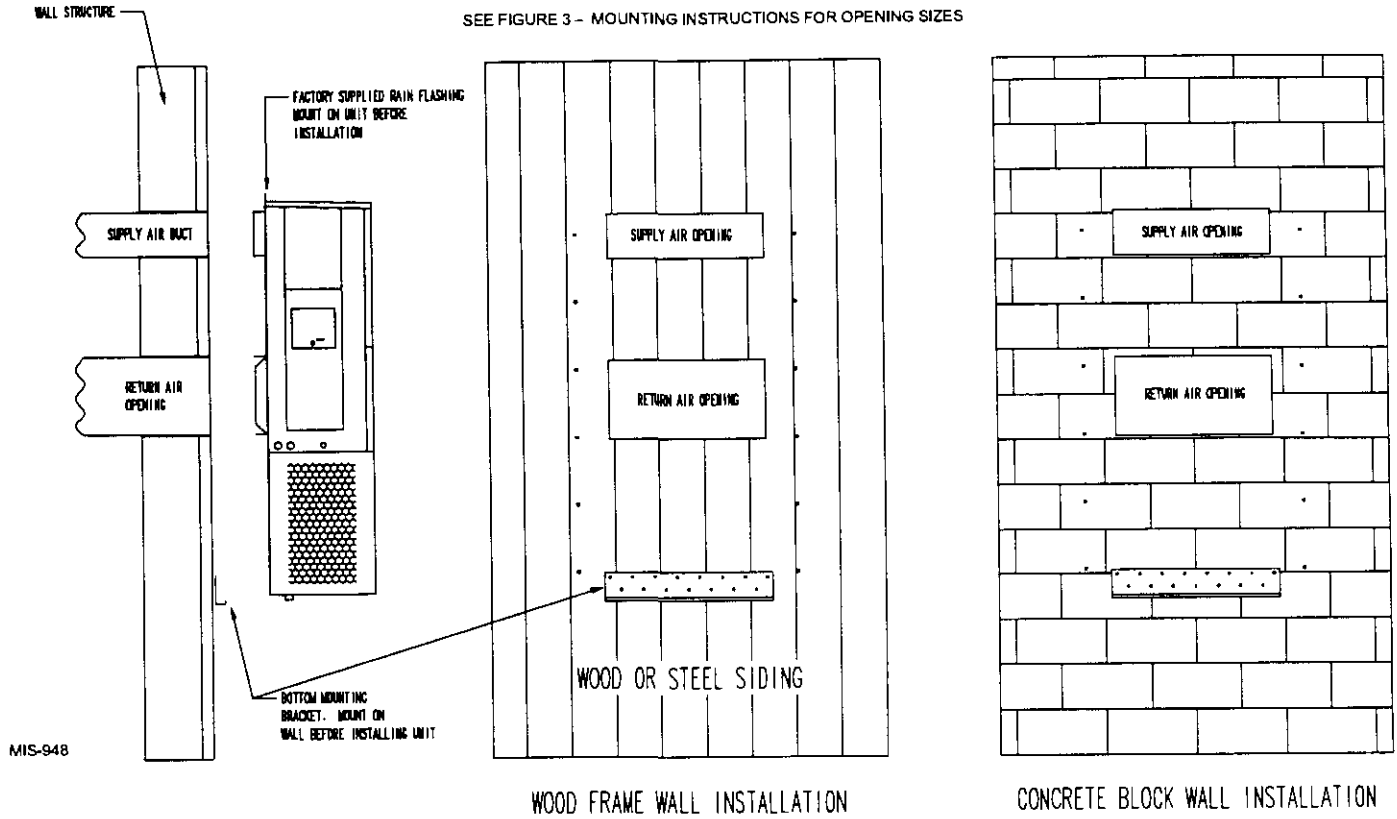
WALL-MOUNTING INSTRUCTIONS
